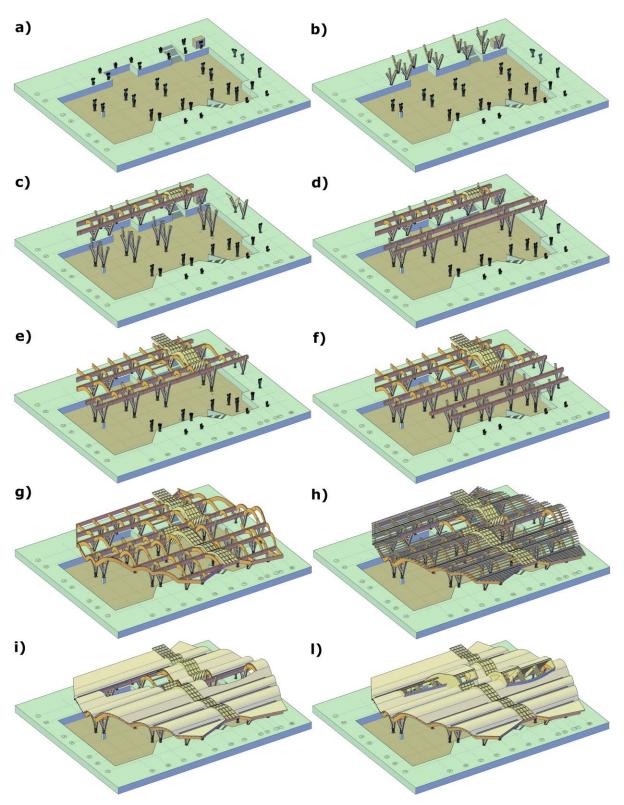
Main Stages of Installation, a) installation of the steel pillars; b) installation of glulam columns (inclined or vertical) to steel pillars; c) connecting the horizontal main beams to the pillars and the arches to the horizontal main beams, including the the provisional wind bracing systems; the beginning of the connection of the glulam columns to the steel pillars of the next span; d) installation of the horizontal beams to the glulam columns; e) connecting the arches to the horizontal main beams, including the wind bracing system for the stability of the structure; installation of the arches and curved beams to the horizontal main beams; connecting the cantilever beams from the first span; f) installation of glulam columns for the last pillars; g) completing the installation of the main beams; h) completing the installation of secondary beams; i) positioning and fixing of the Cross-Lam structural roof pannels; l) installation of emerging skylights and work completion
